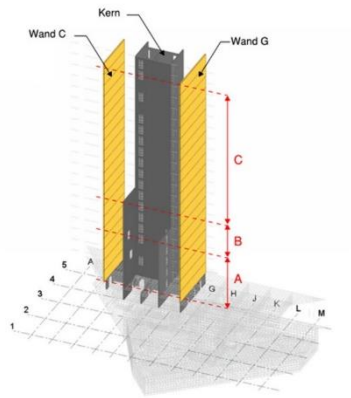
Stability system Haut. From “Haut - A 21-storey Tall Timber Residential Building”, by R. Verhaegh et al., 2020, *International Journal of High-Rise Buildings*, 9(3), p. 216.
